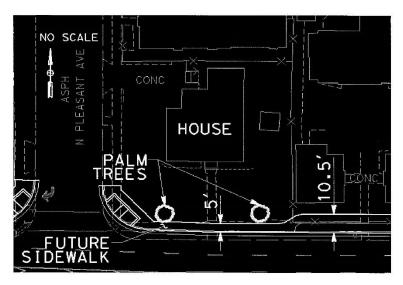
The City of Ontario reviewed but did not accept plans which would have removed a proposed parkway, which would have left the two historic date palms in their current location.
